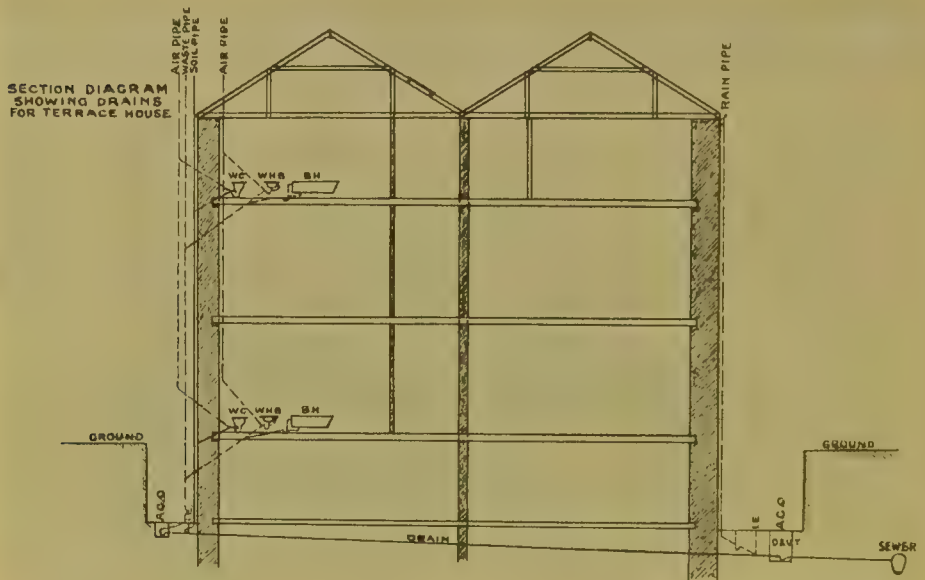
is a Section Elevation Plan of a Terrace House, showing the arrangements of waste-pipe, soil-pipe, roof-pipe, traps, and house-drain. W.C. = Water-Closet; W.H.B = Wash - Hand Basin; B.H. = Bath. The other terms as in previous Figure (184).
